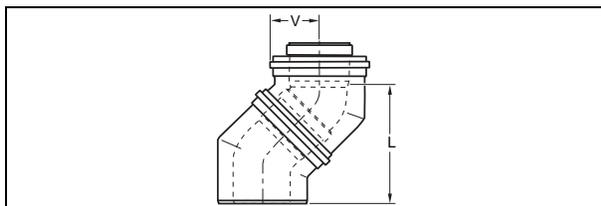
Offset dimensions, concentric bend Ø 110/160 (dim. → tab. 90)
